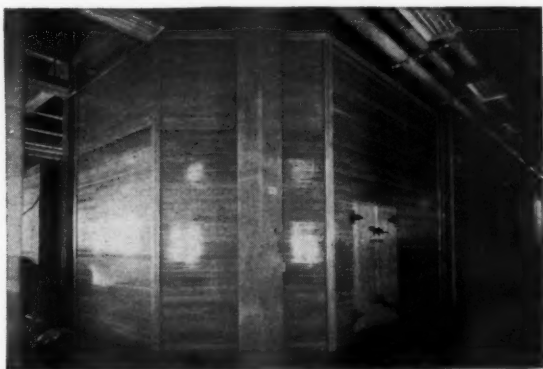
EXTERIOR VIEW OF REAR AND SIDE OF FAN TEST ROOM
